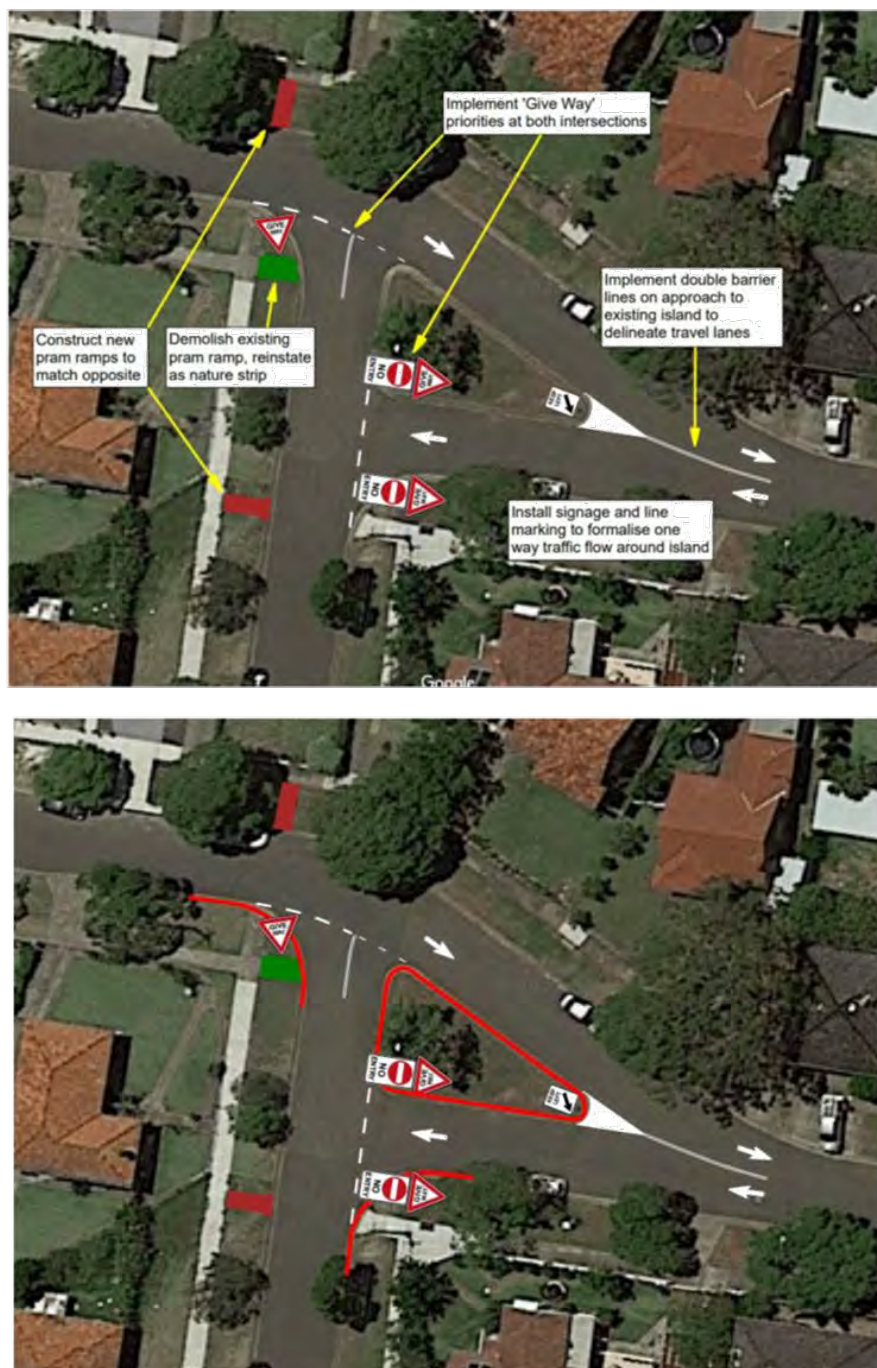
proposed one way treatment around Mintaro Avenue and Noble Avenue with parking restrictions
